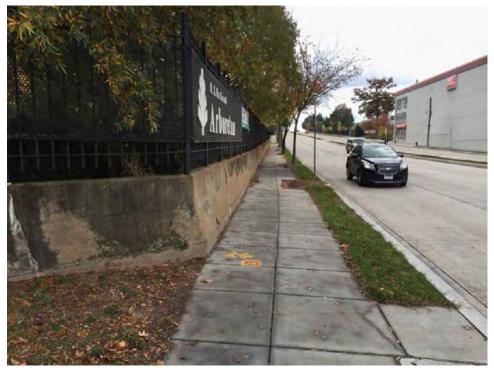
SOUTH VIEW ALONG BLANDENSBURG ROAD
